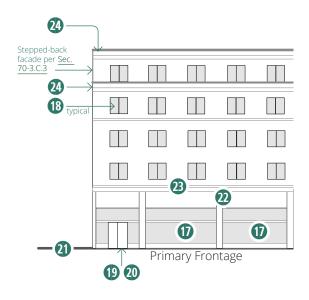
C-4. Storefront Building Elevation: Facade Design Requirements
